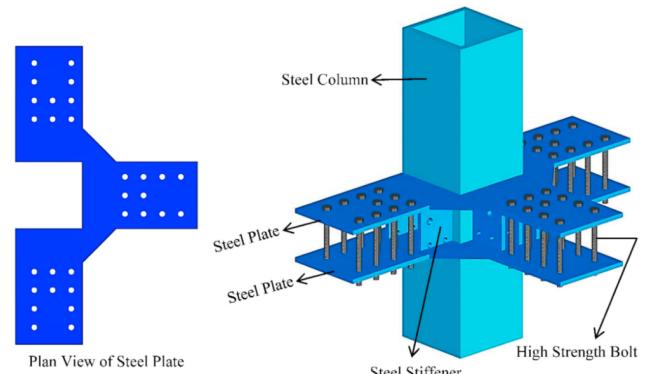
Propose flat slab to steel column connection configuration(Rafiee et al., 2021).
